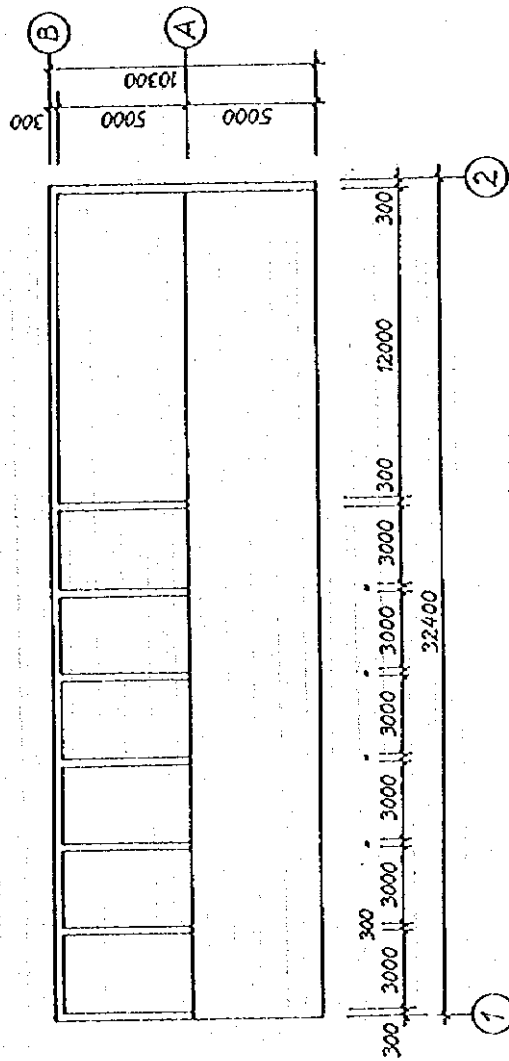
Construction Plan for an Insulation Work of the Barns
